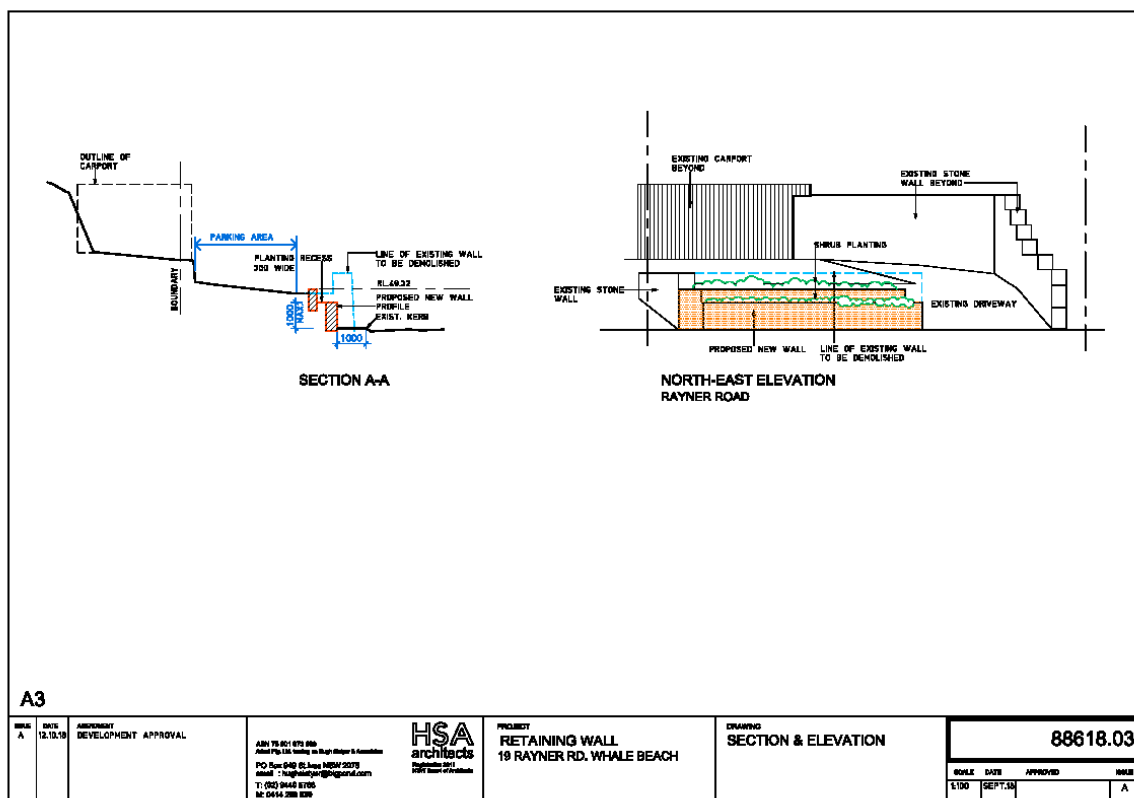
Section - Proposed driveway & sandstone retaining walls
